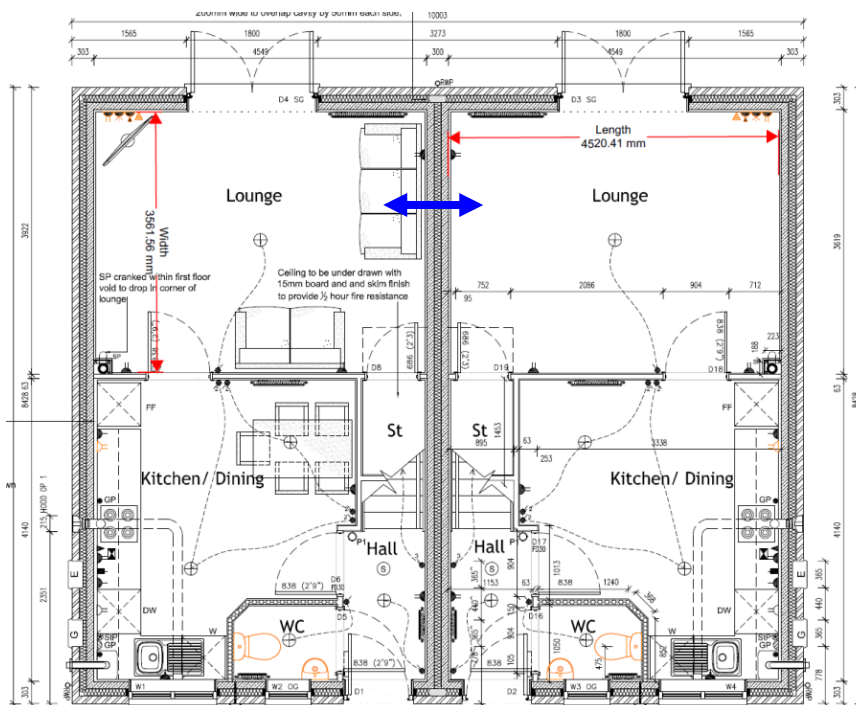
Room layout plan – Ground floor Lounge – Arrow shows test wall
